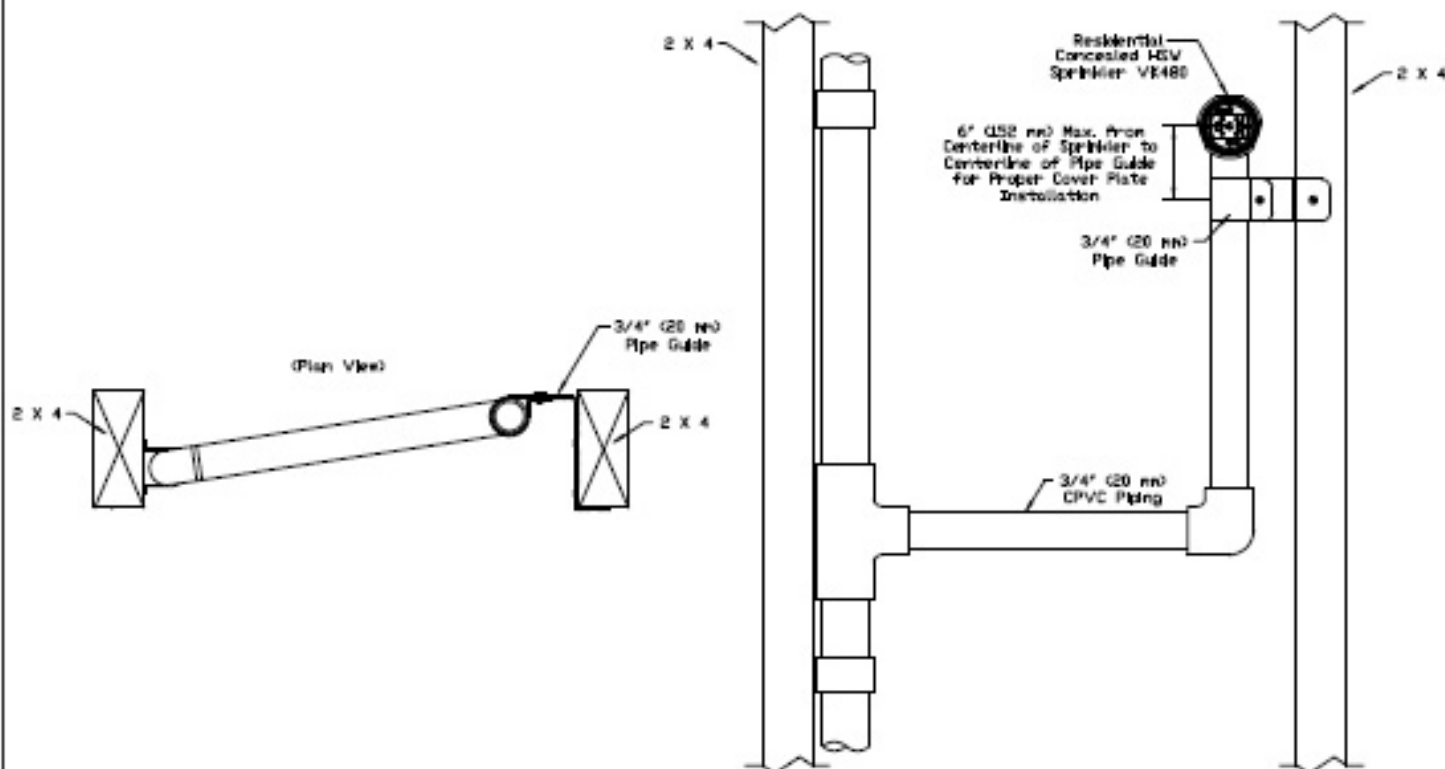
Sprinkler VK480 Pipe Guide Installation Instructions
